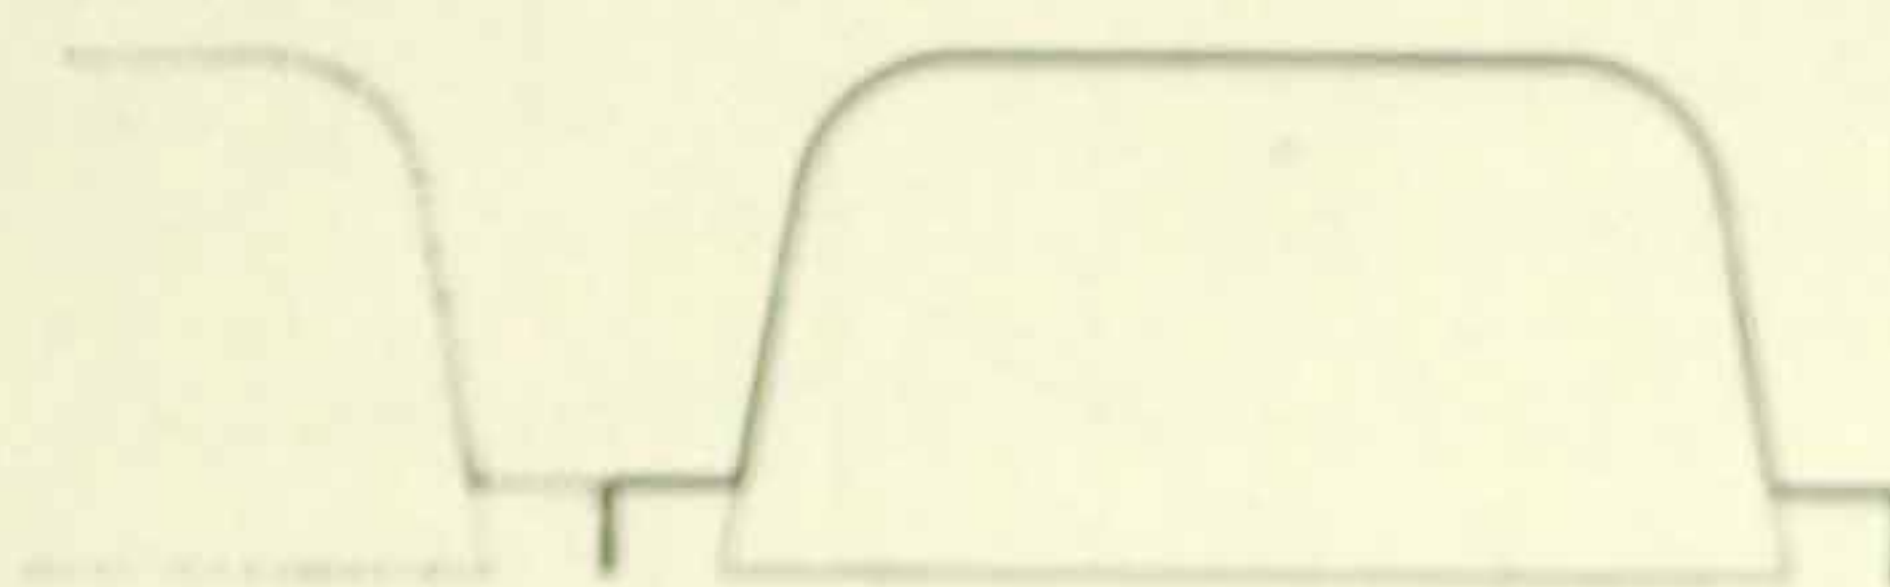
SECTION OF DOME SHOWING FORM FOR TRANSVERSE JOIST
